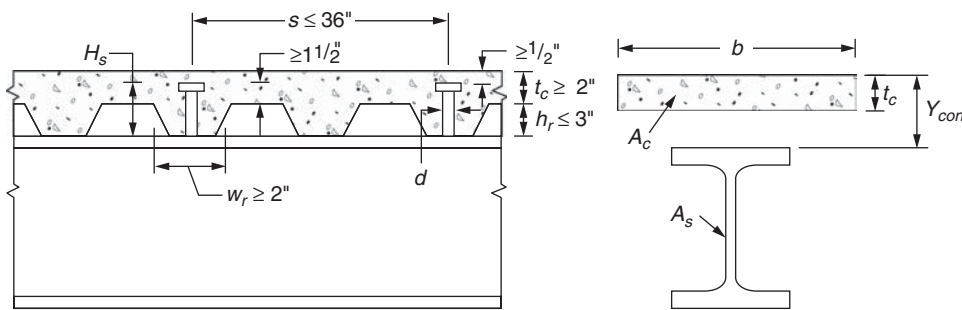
Formed steel deck with ribs perpendicular to beam.
